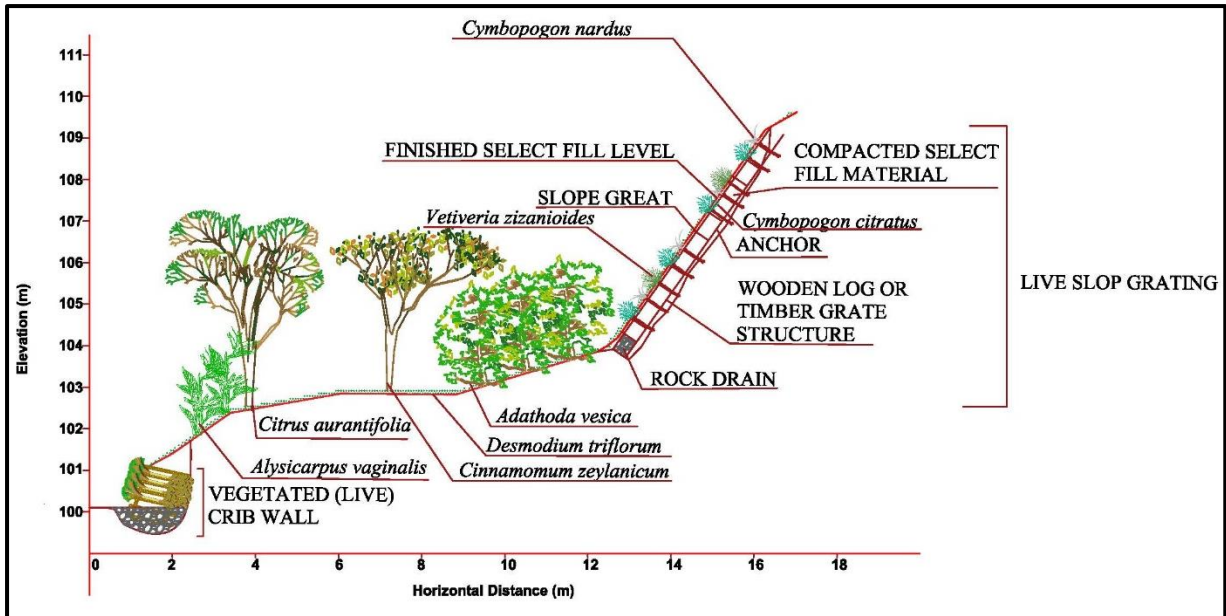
Cross section showing proposed stabilization measures for Area 4
